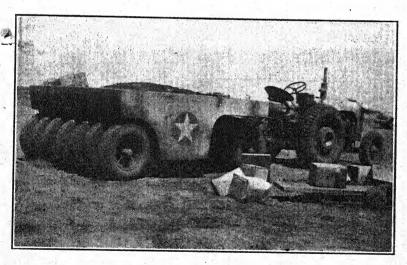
RUBBER TYRED ROLLER—TOWED, 13 ROLLER WHEELS. WESTERN DESERT
